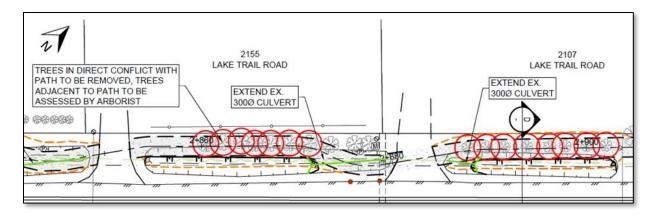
Vegetation removal and culvert extensions required at 2155 Lake Trail Road alongside a drainage ditch.
